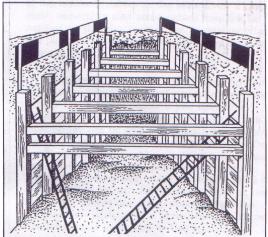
Shoring to prevent the collapse of the sides of an excavation consisting of timber or steel frames with close boarding between frames
